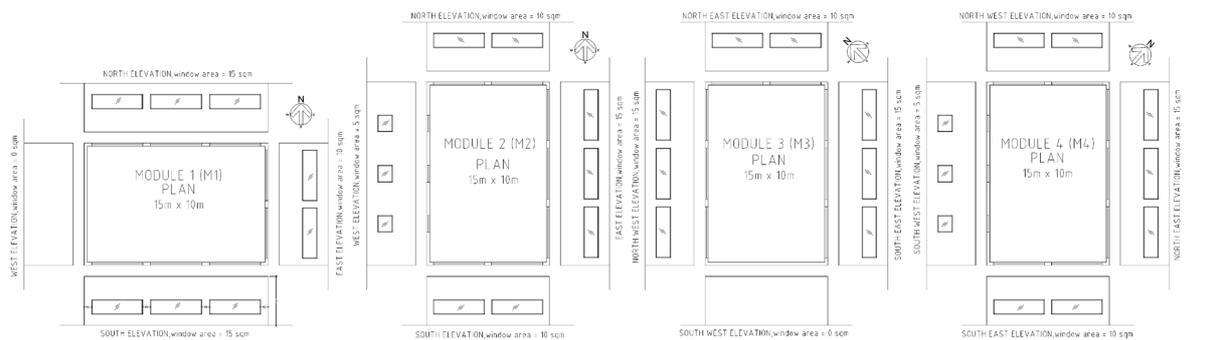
Plan & elevations of design cases for Trichy 20 WWR
